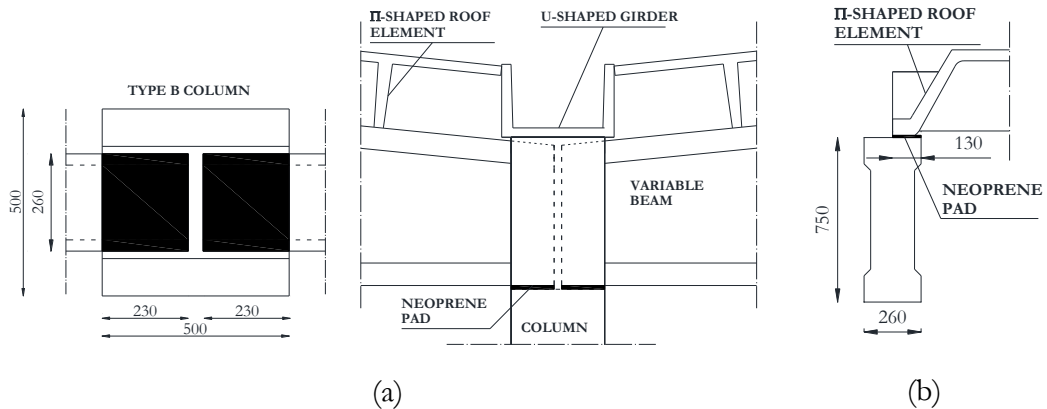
Friction beam-to-column (a) and roof-to-beam (b) connection
